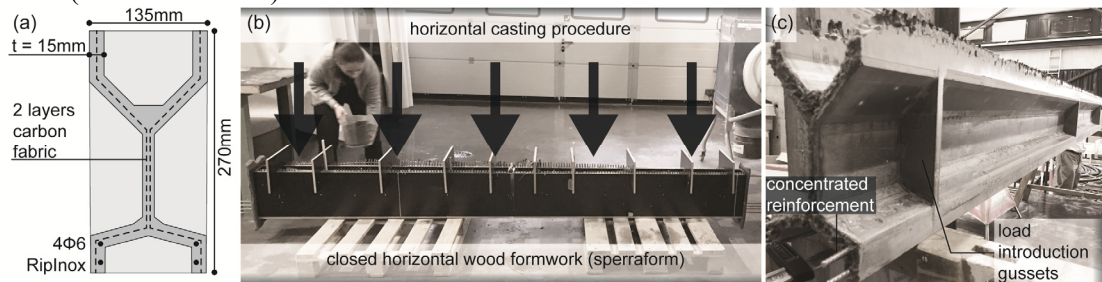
X-beam: a) cross-section, b) casting procedure, c) demoulded element.
